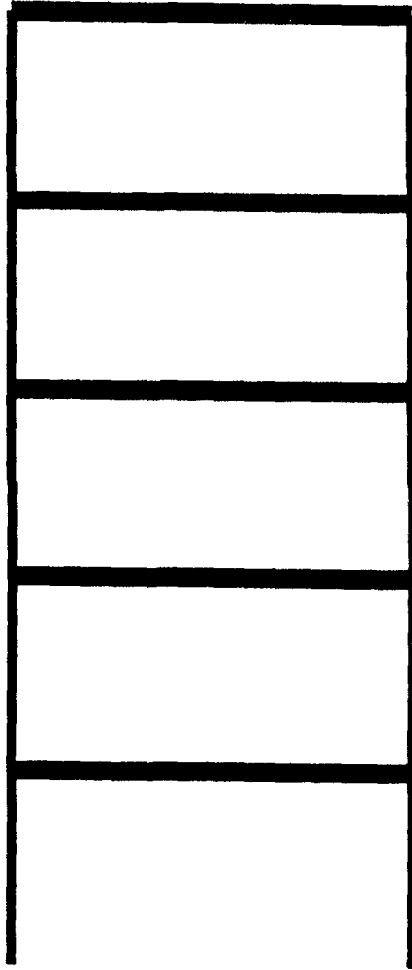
Five Story Reinforced Concrete Building Model Subjected to Base Excitation.
